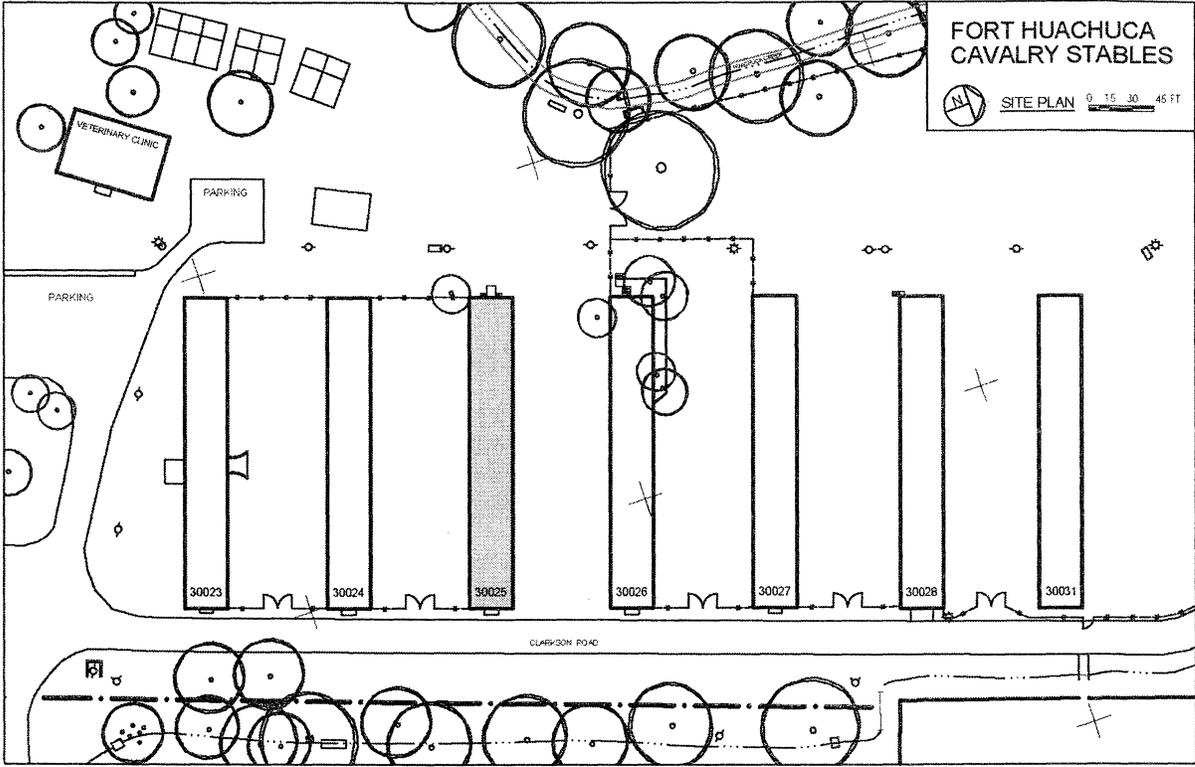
SITE PLAN SHOWING BUILDING 30025 LOCATION.
